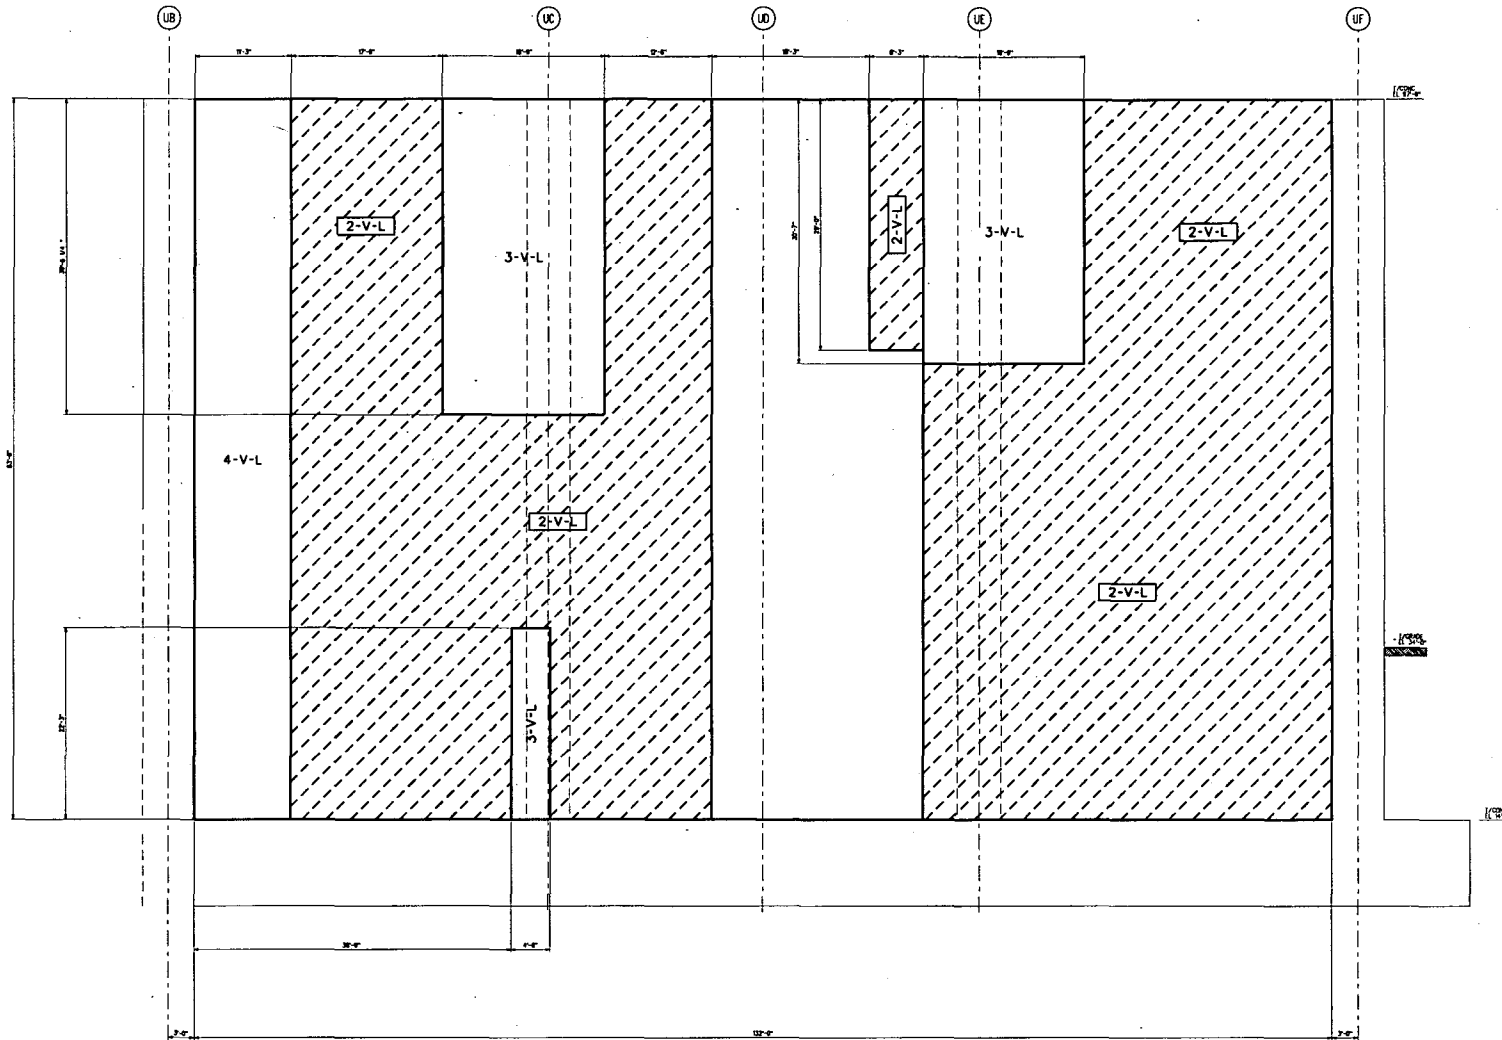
H.6-96: BASIN/EAN EAST WALL LOOKING WEST
